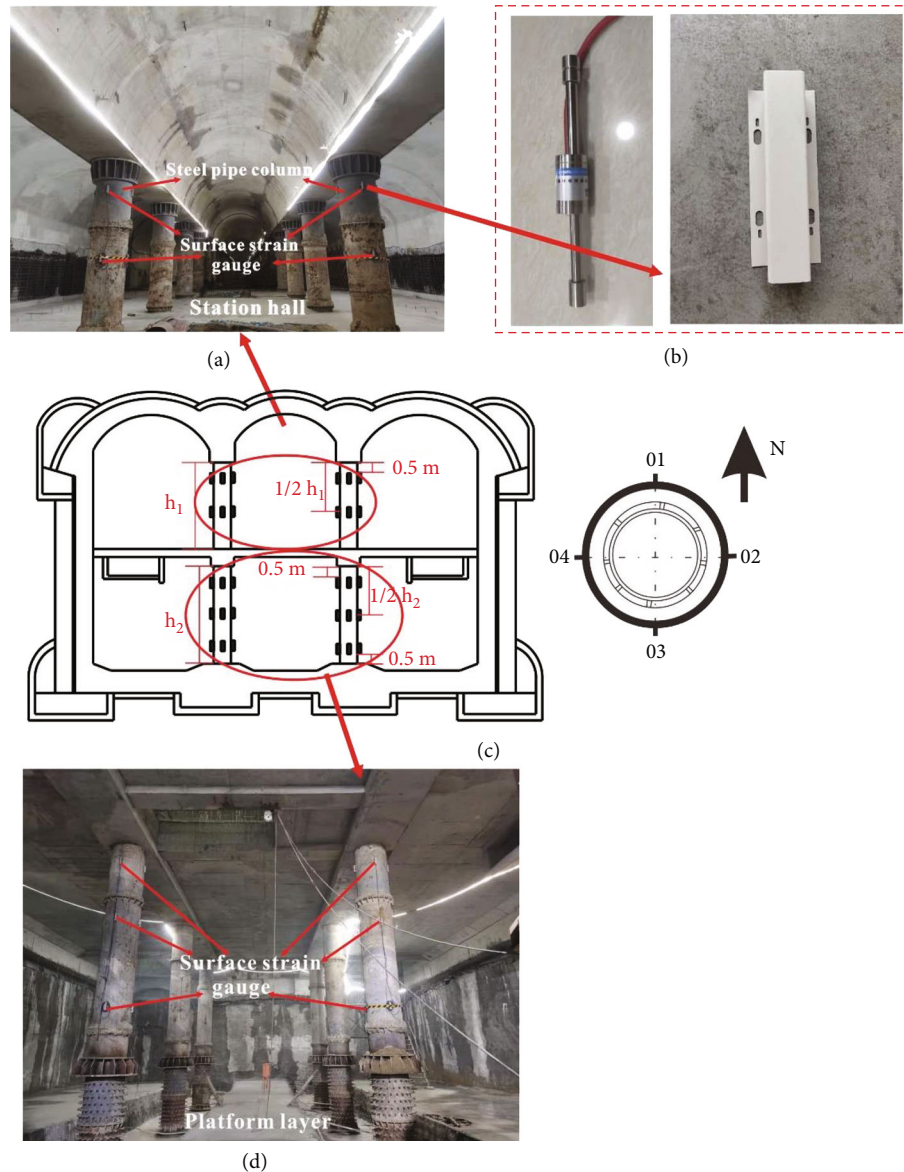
Sketch of onsite installation: (a) installation in the station hall; (b) sensor and protective shell; (c) sensor layout diagram; and (d) installation in the platform layer.
